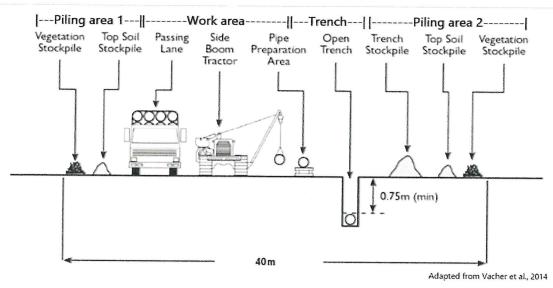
A schematic of the pipeline installation process, detailing multiple piling storage areas utilizing a double lift method for soil extraction, the work area or road, and the pipeline trench. Figure adapted from Vacher et al., 2014.
